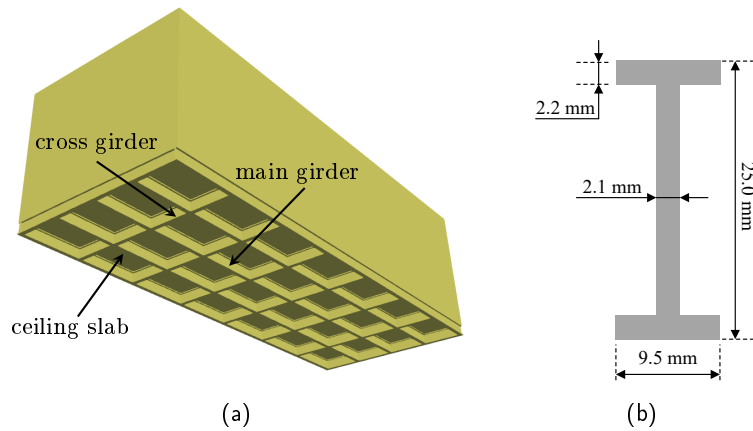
Illustration of the (a) overall shape and (b) cross section of I-beam grillage mounted underneath the deck.
